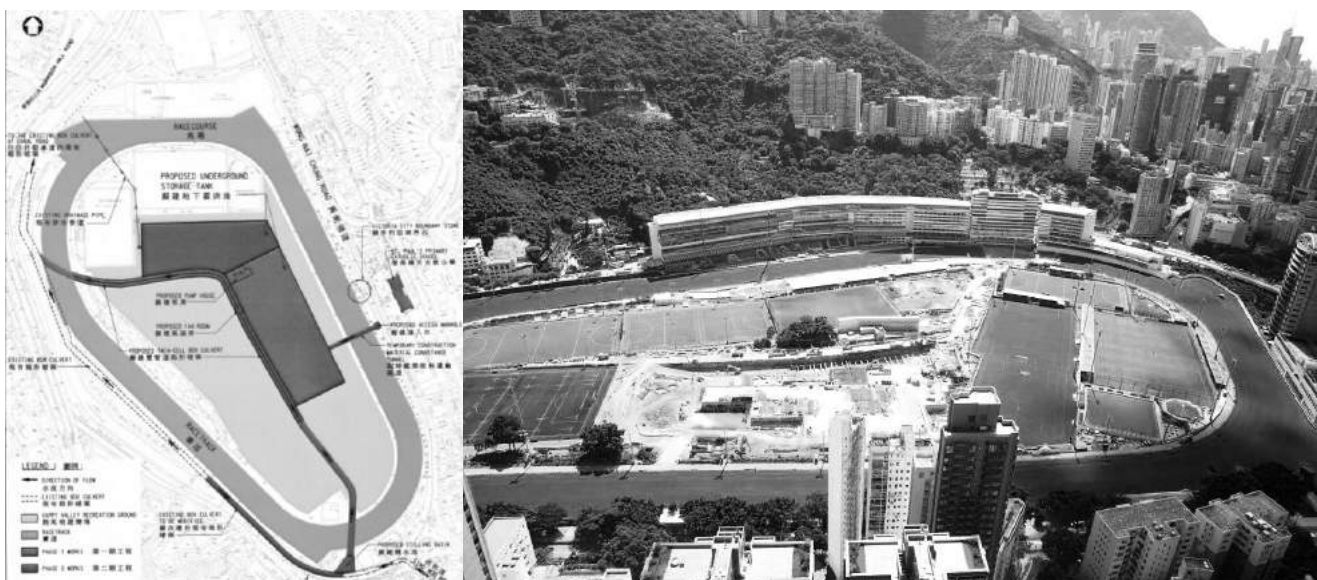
Working plan and arrangement of HVUSSS and bird eye view of the Happy Valley Recreation Ground during construction
